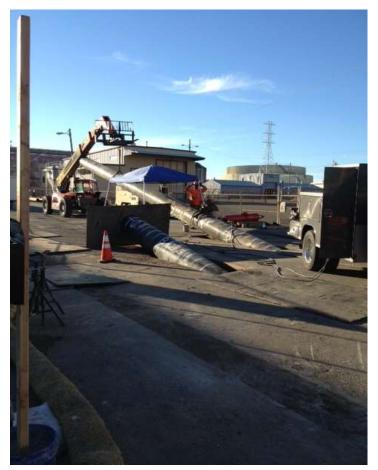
HDD equipment being staged at 23rd Street. View northwest, October 29, 2014.
